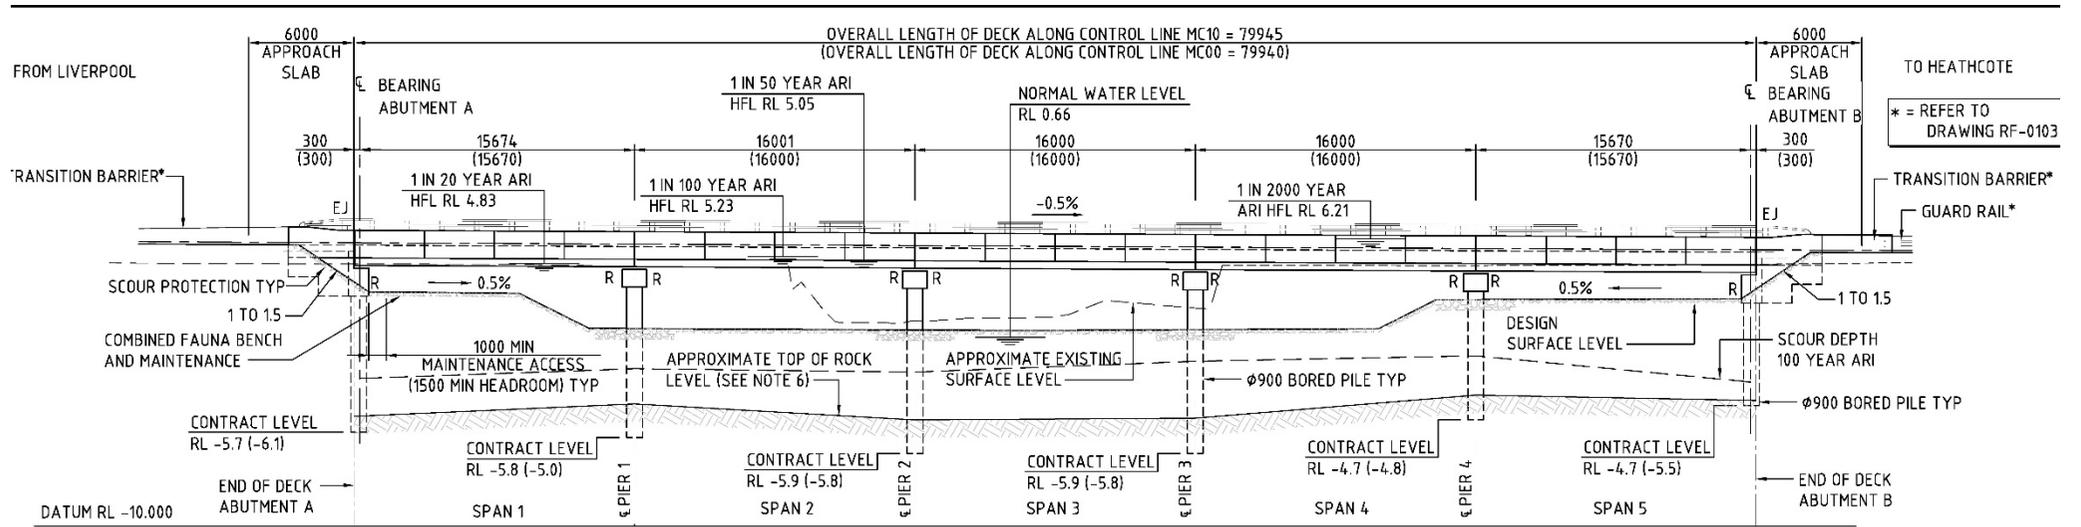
Harris Creek twin bridges – elevation of westbound bridge
